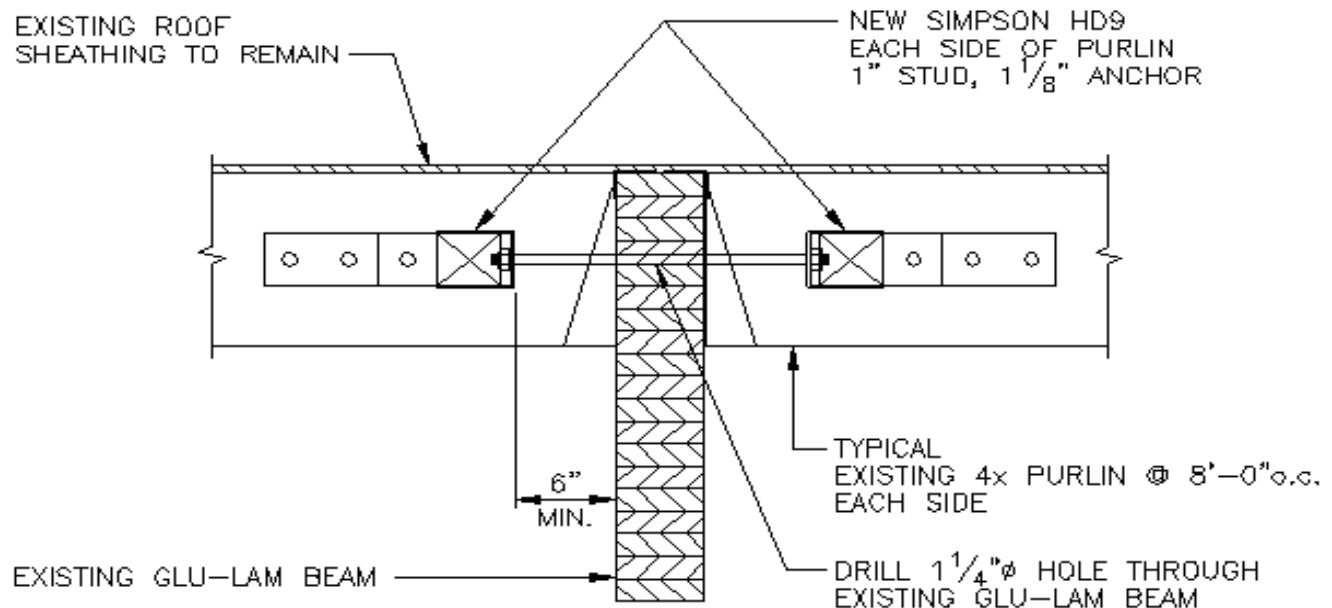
TYPICAL CROSS TIE PURFLIN TO GLULAM BEAM CONNECTION DETAIL
